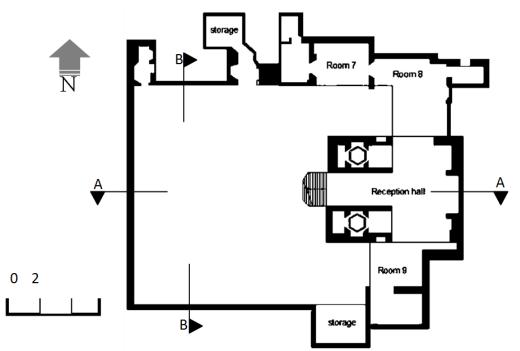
Basment-floor plan of a traditional building in Kashan (University, 2005)
